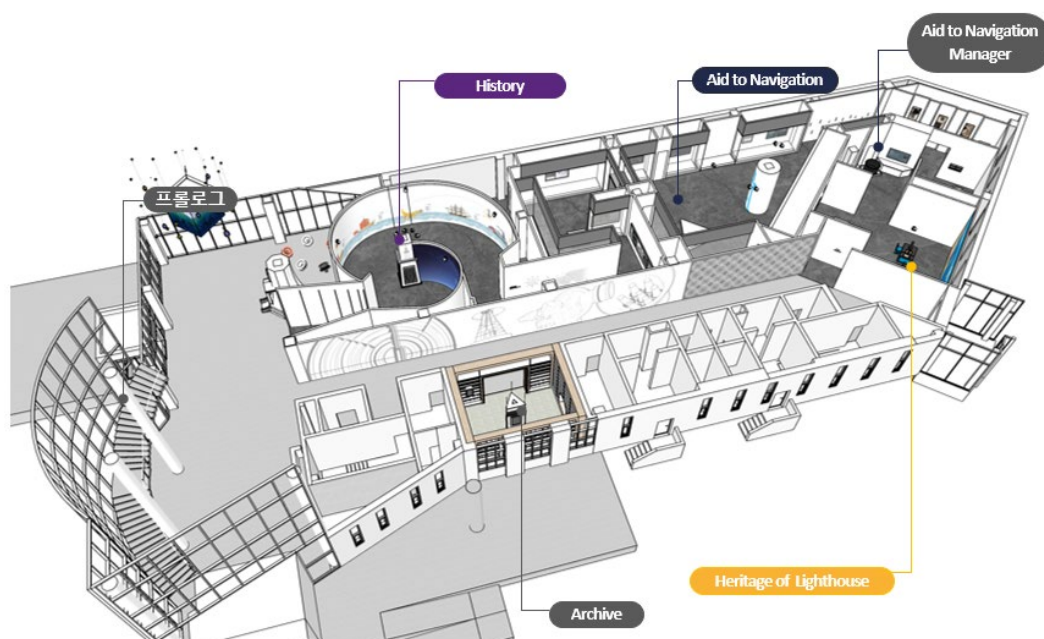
1st Permanent Exhibition Room "Lighthouse of Time" Floor Plan
